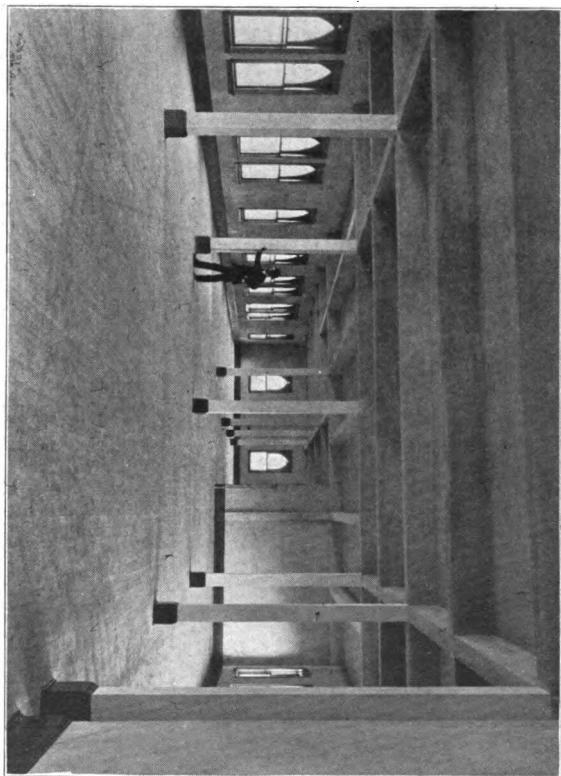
Columns and Girders in an upper floor. Span, 24 feet. Salvation Army Building, Cleveland.
